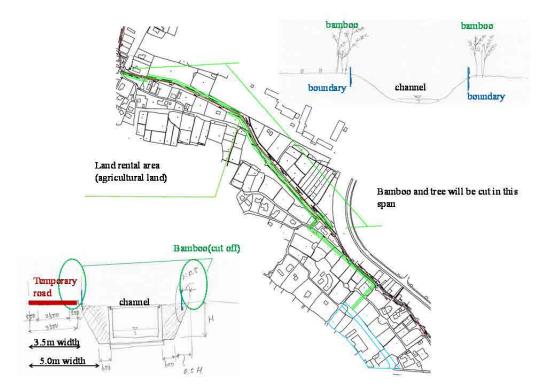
Temporary Approach Road for Rehabilitation of the Japanese Bridge Canal
